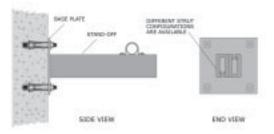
Attach to the wall with angle or strut welded to base plate.
